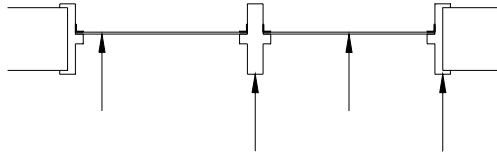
Test Assembly Elevation Location of Impact Points Described in Table 1
